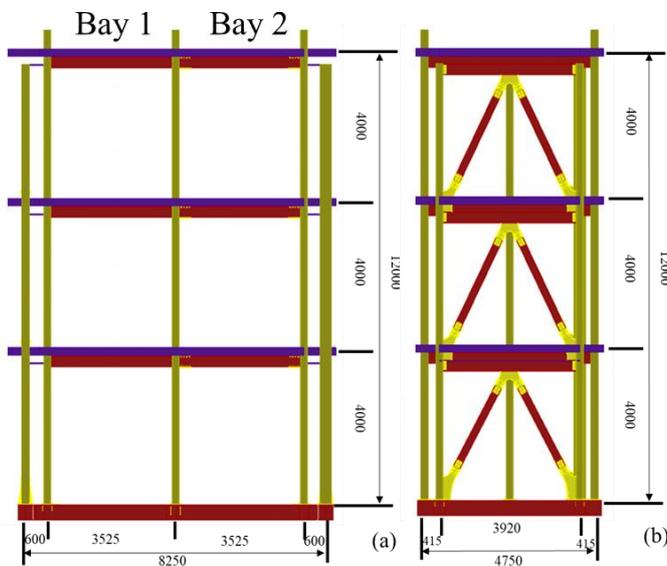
Elevation of Proposed Structure in (a) X Direction and (b) Y Direction
